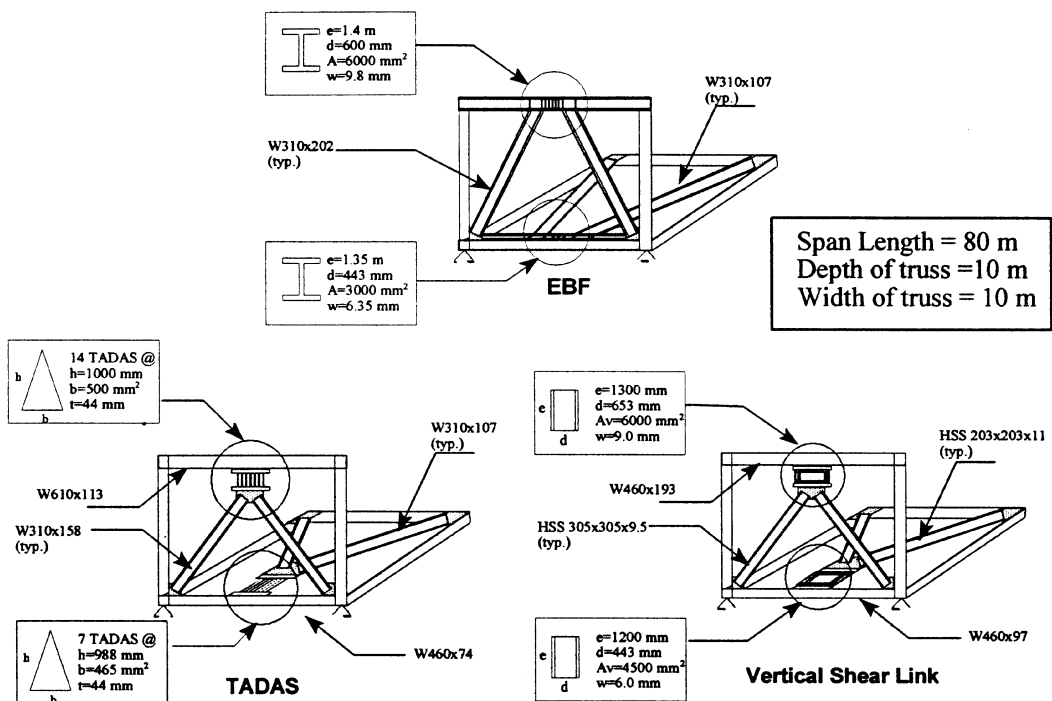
Examples of ductile retrofit systems at span end of deck-trusses.
